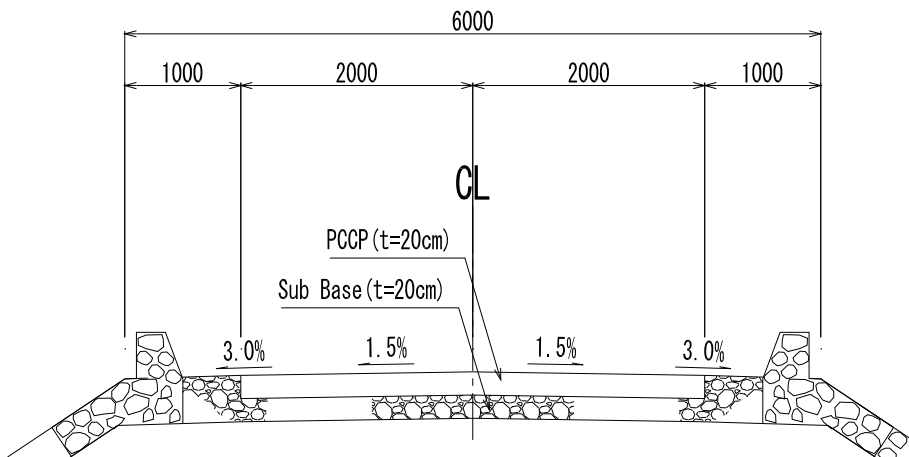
Typical Cross-section of Approach Road (Bazal bridge)
